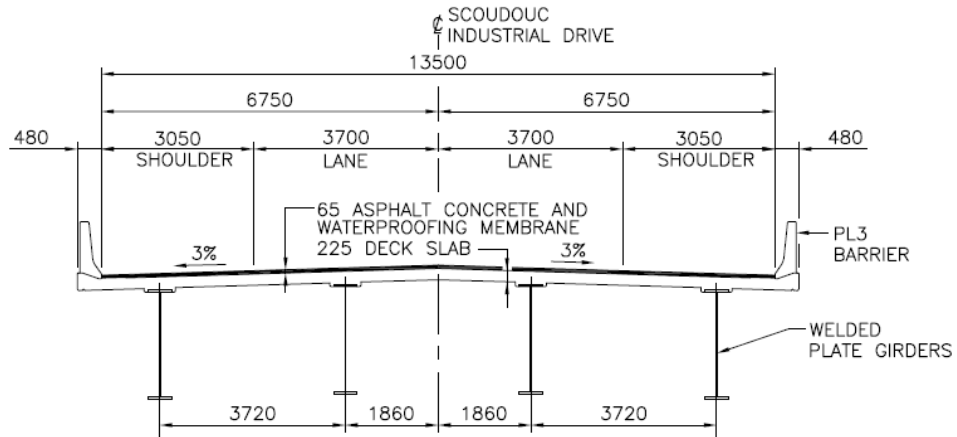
Cross-Section of Scoudouc Bridge. (NBDTI, 2009)
